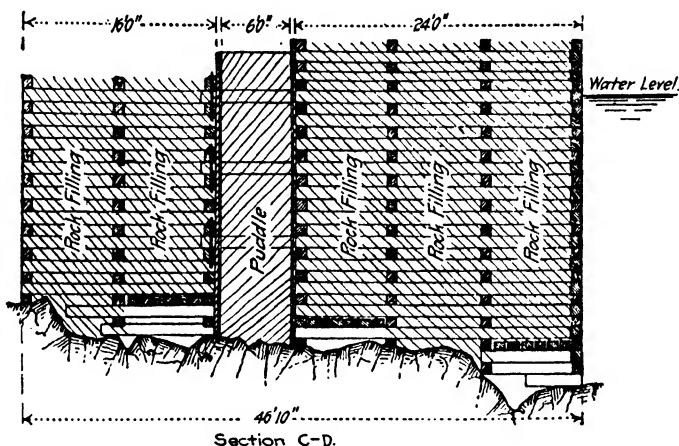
Typical Section of Crib Cofferdam. Niagara Power Plant, Electrical Development Co. of Ontario.
